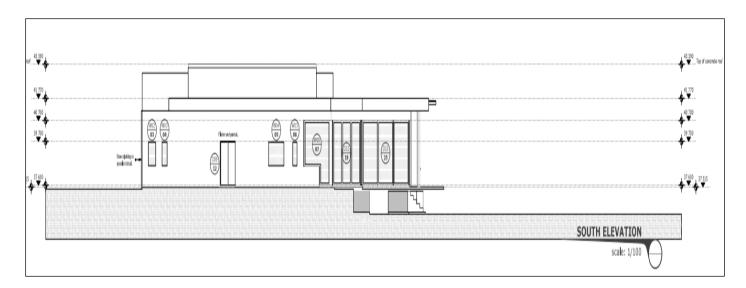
South elevation of the proposed entertainment facility (TMBA, 2018)
